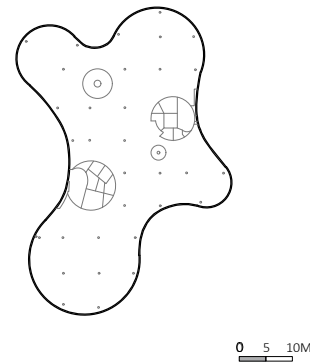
Author's sketches of the plans of the buildings with the undulating wall
